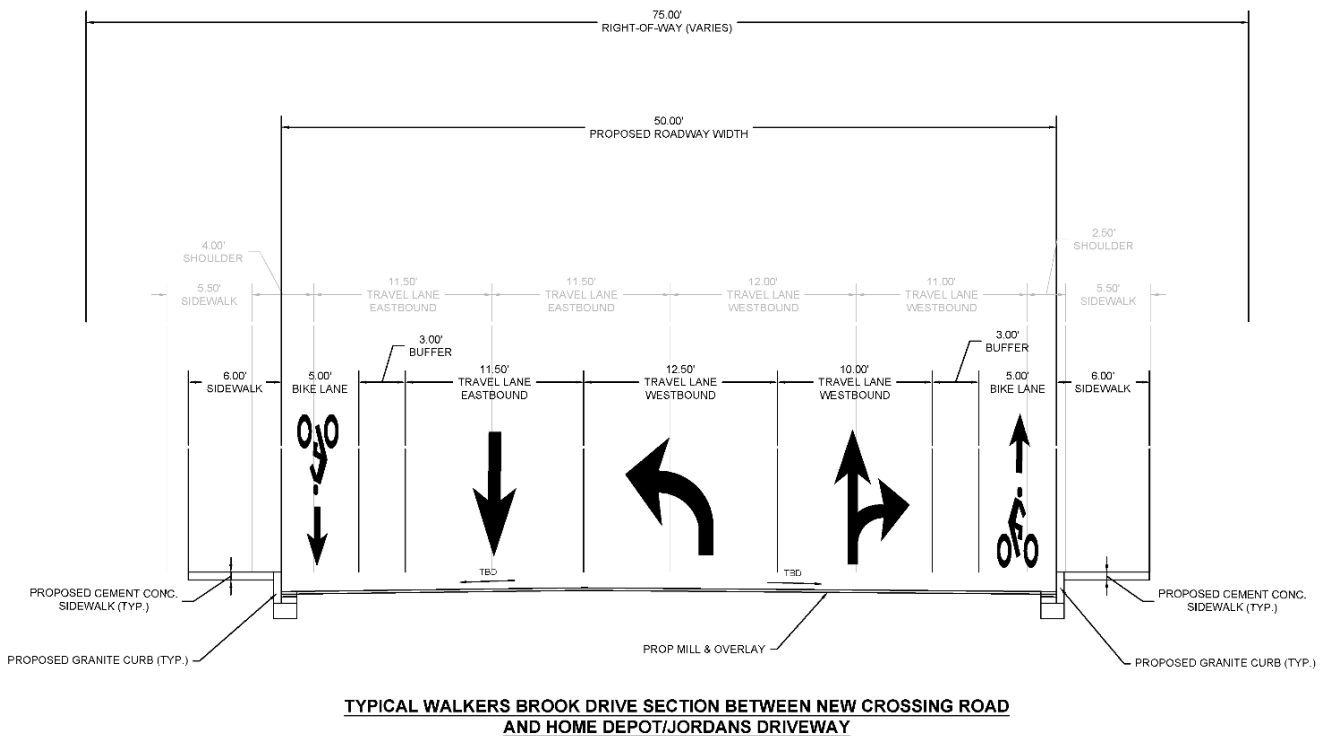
Alternative 1 (on-road buffered bicycle lanes) – Typical Section 1
